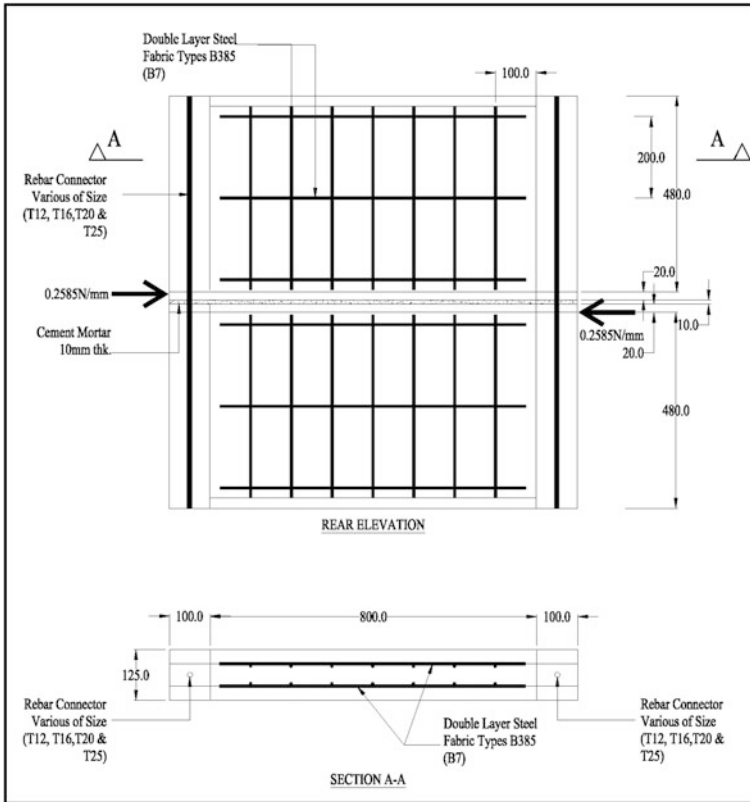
RC stocky wall detailing model with rebar connector of various size
